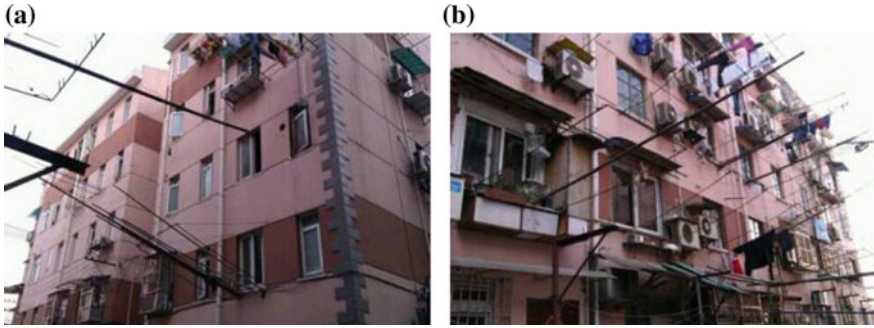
Test building photographs: a north facade photograph, b south facade photograph
